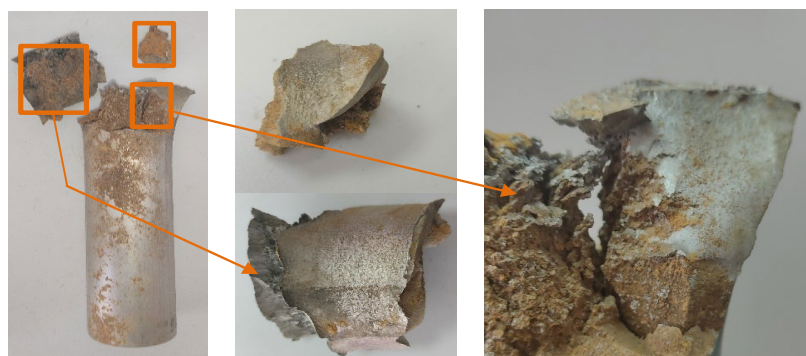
Shattered fragments and large cracking discovered in specimen B
